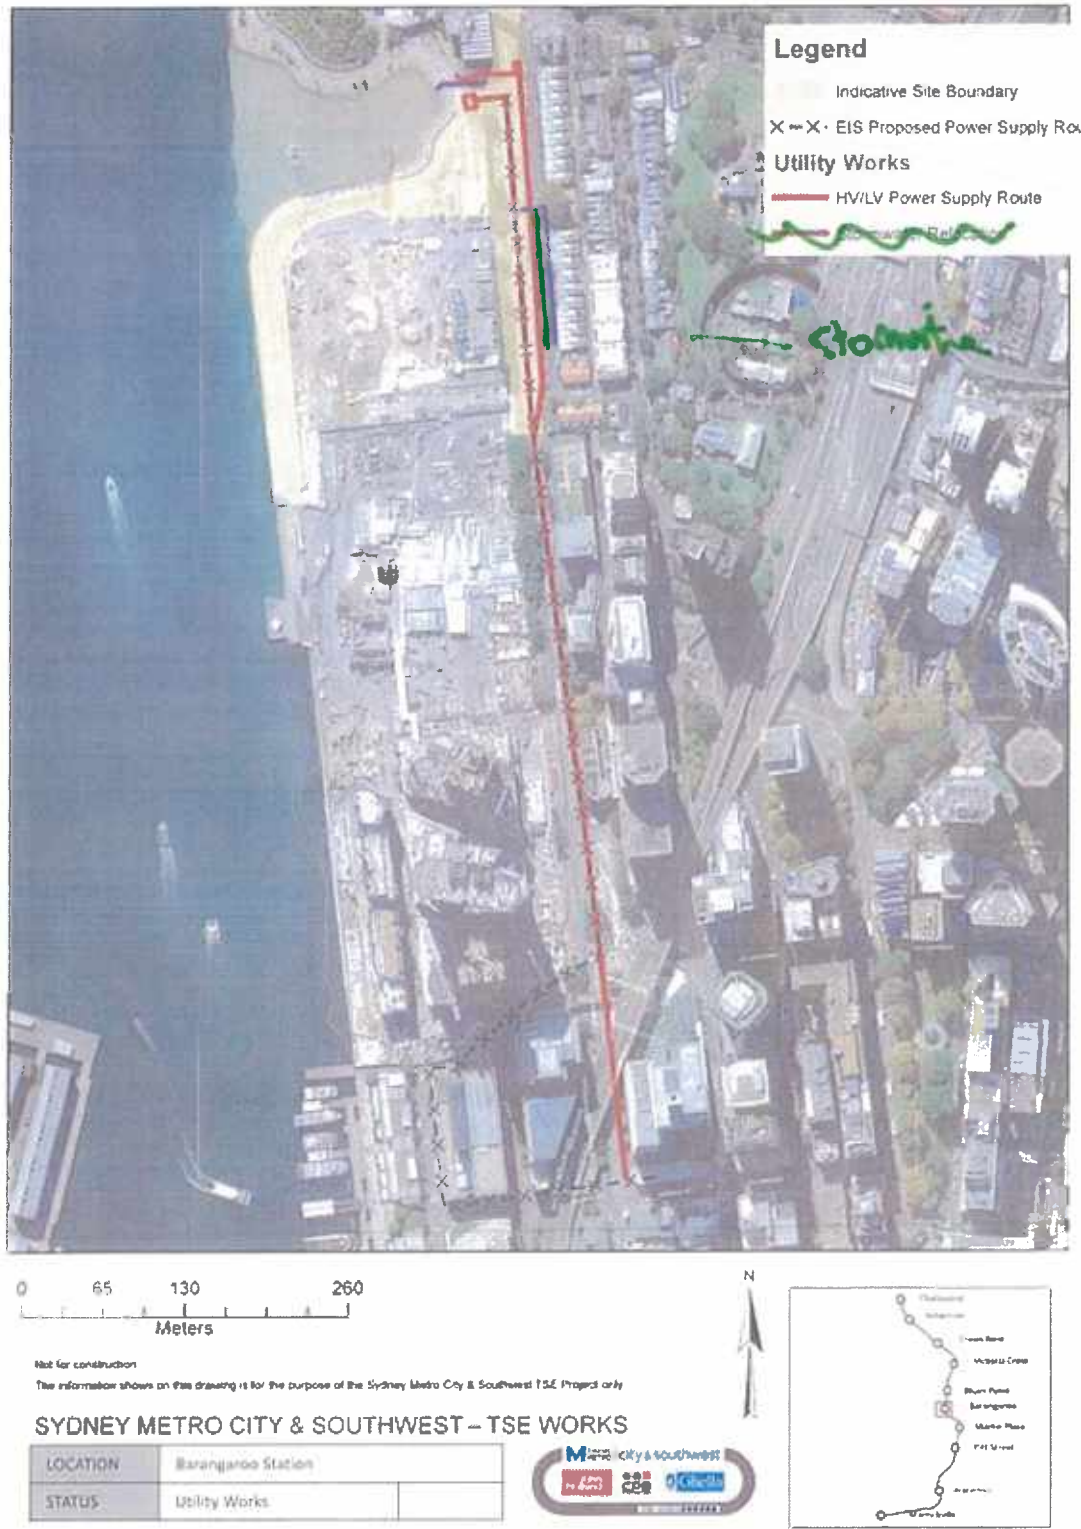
The Barangaroo Station site with the proposed stormwater trench highlighted in green.
